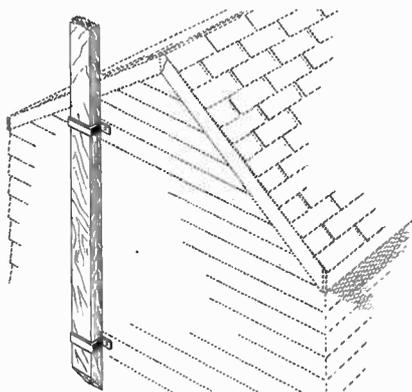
Wooden Mast Mounted on a Wall with Metal Brackets.
